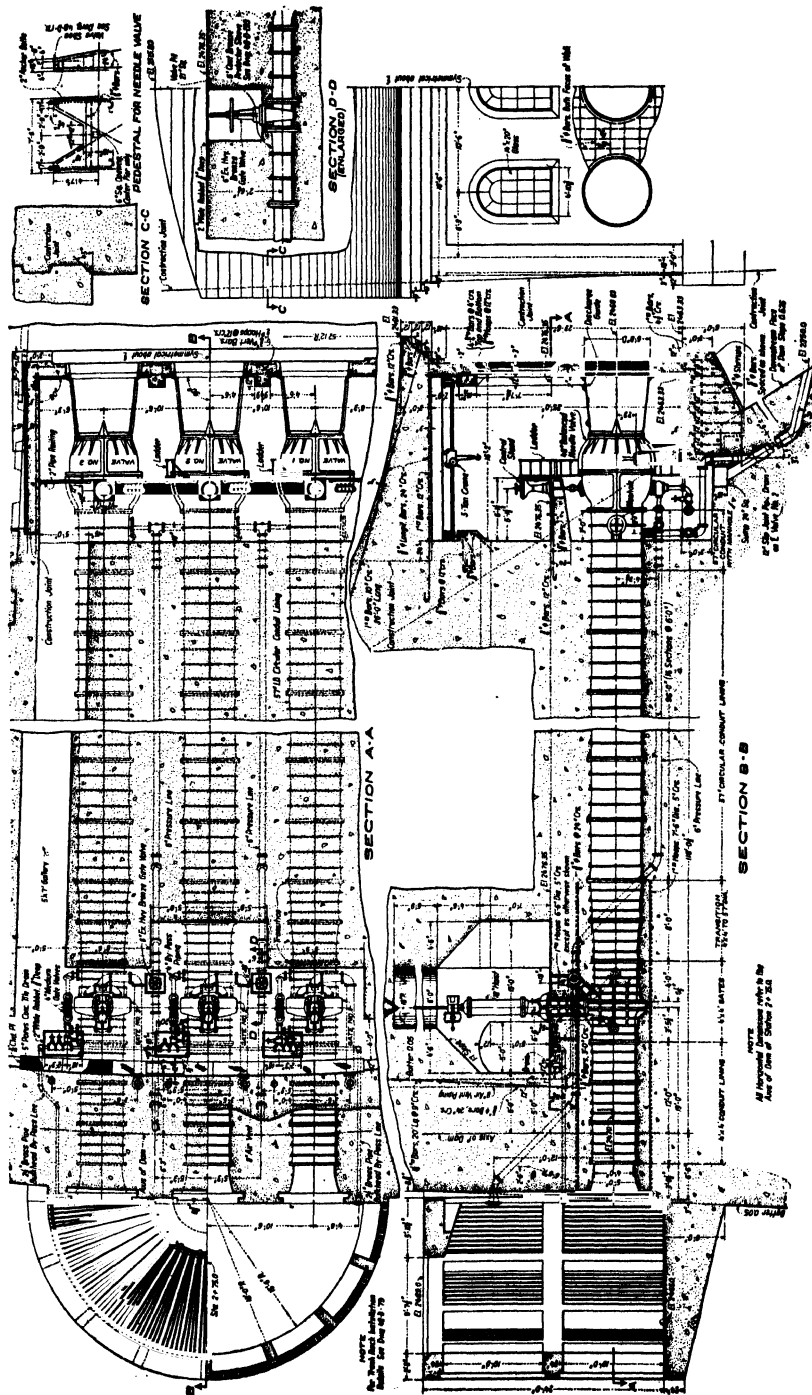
Irrigation outlet installation, Owyhee Dam.
